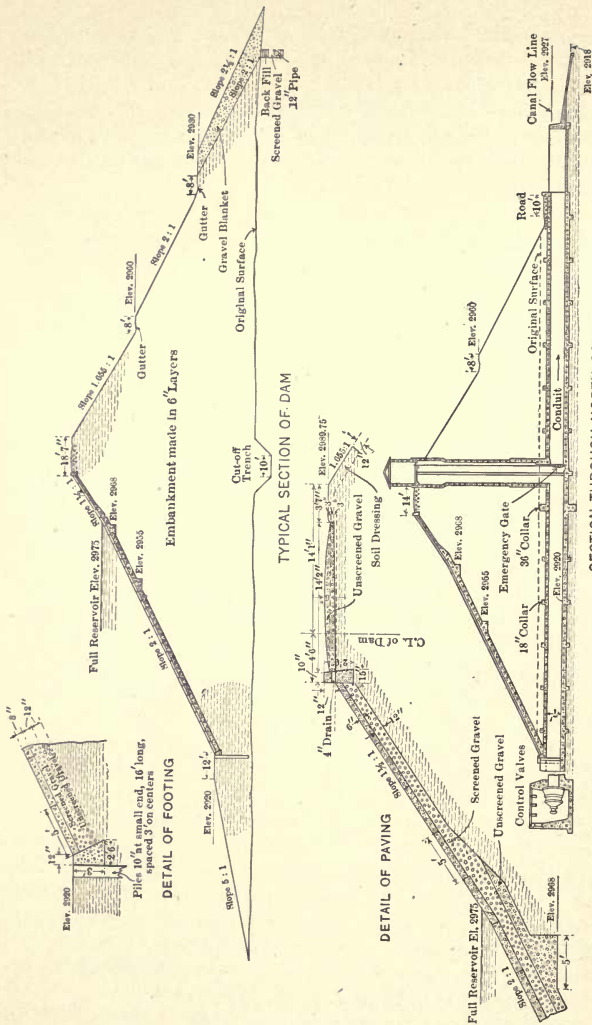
Sections of Owl Creek Storage Dam, Belle Fourche Project, S. D.
